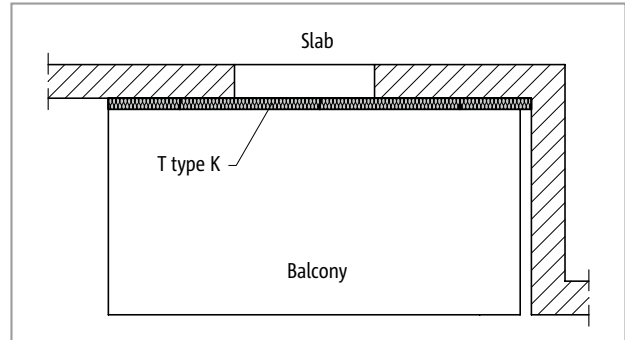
Schöck Isokorb® T type K: Balcony with facade offset
